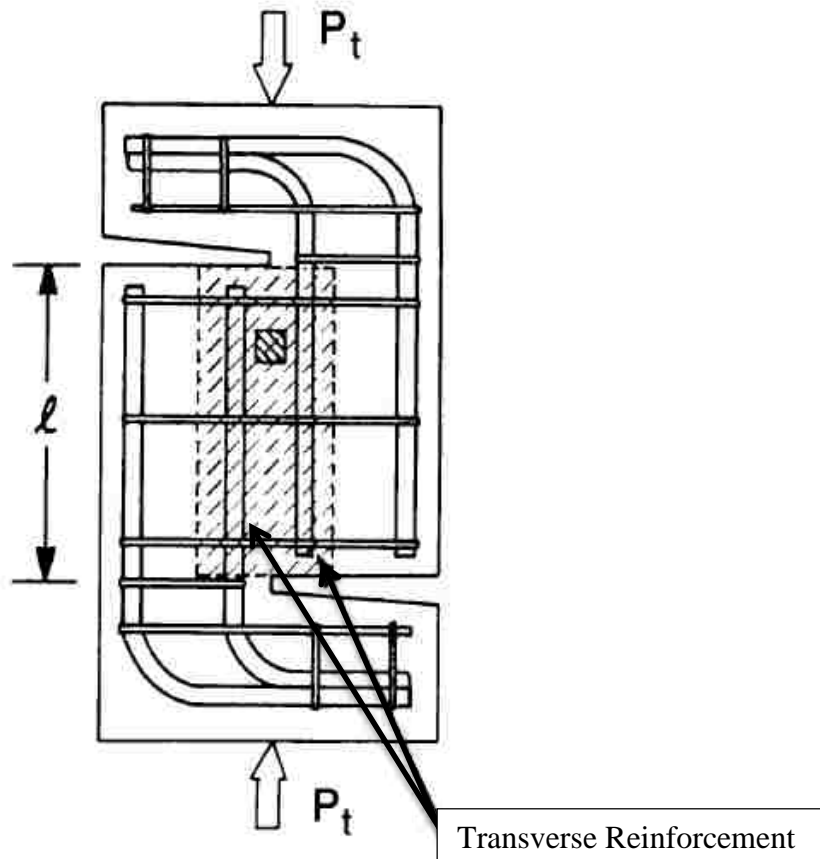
Location of transverse reinforcement (Hsu, Mau, and Chen, 1987)
